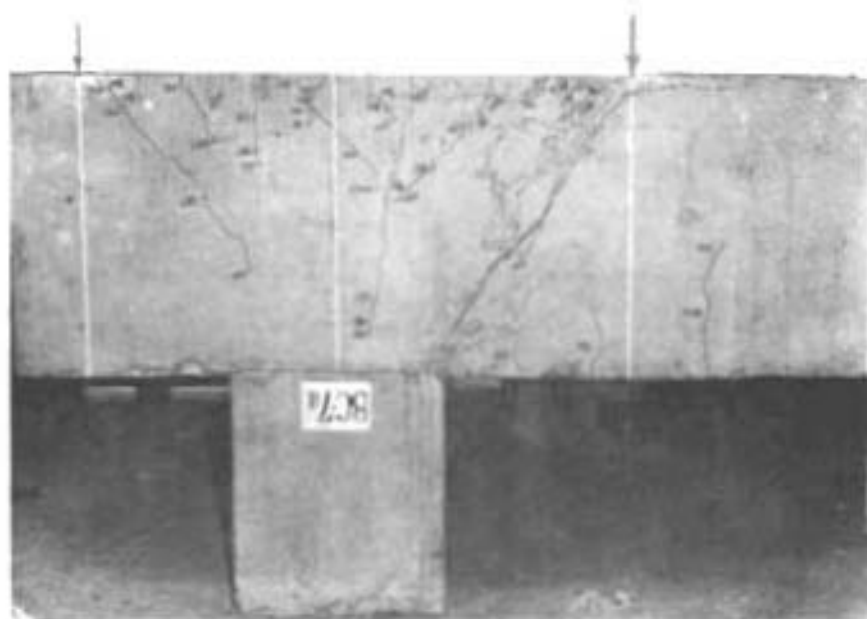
Bond splitting between moment crack and load (which is beyond point of inflection).
